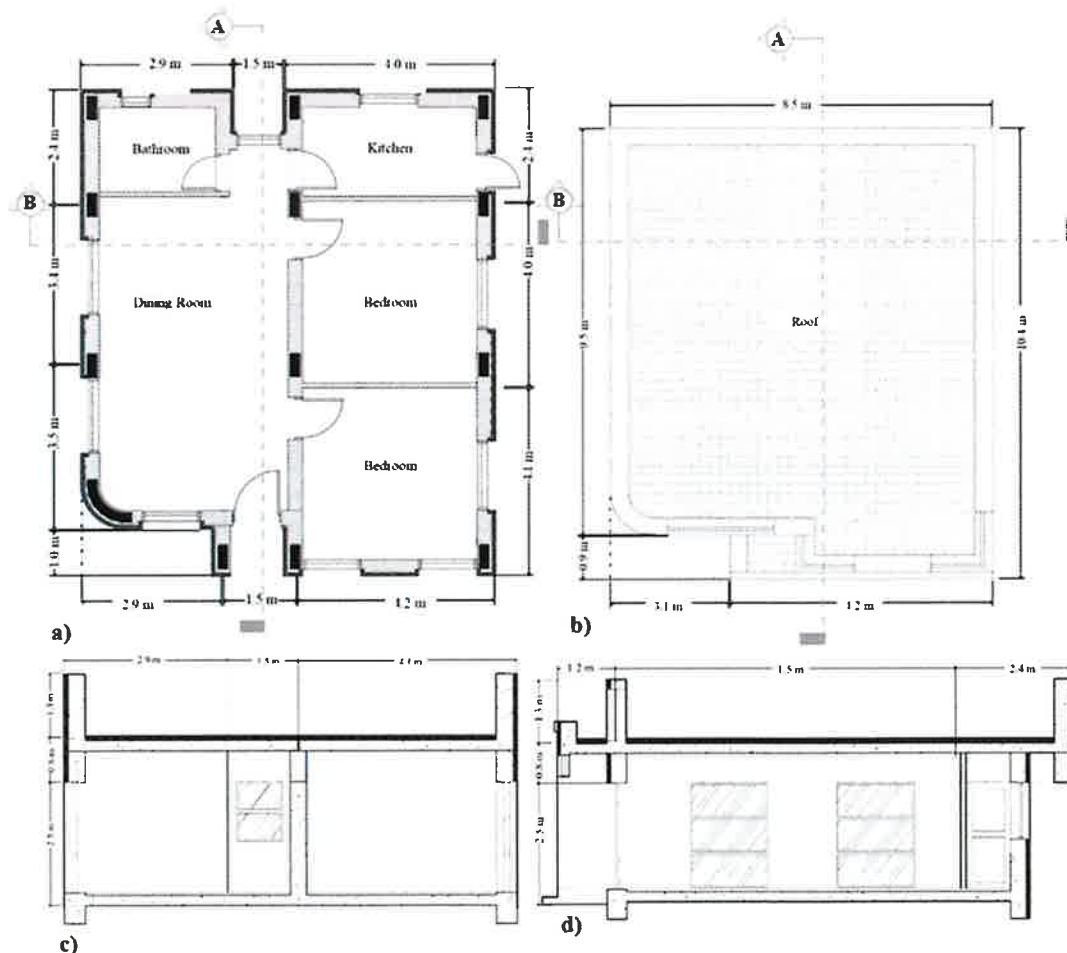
The technical drawings for (a) ground floor, (b) Site plan, (c) section A, and (d) section B.
